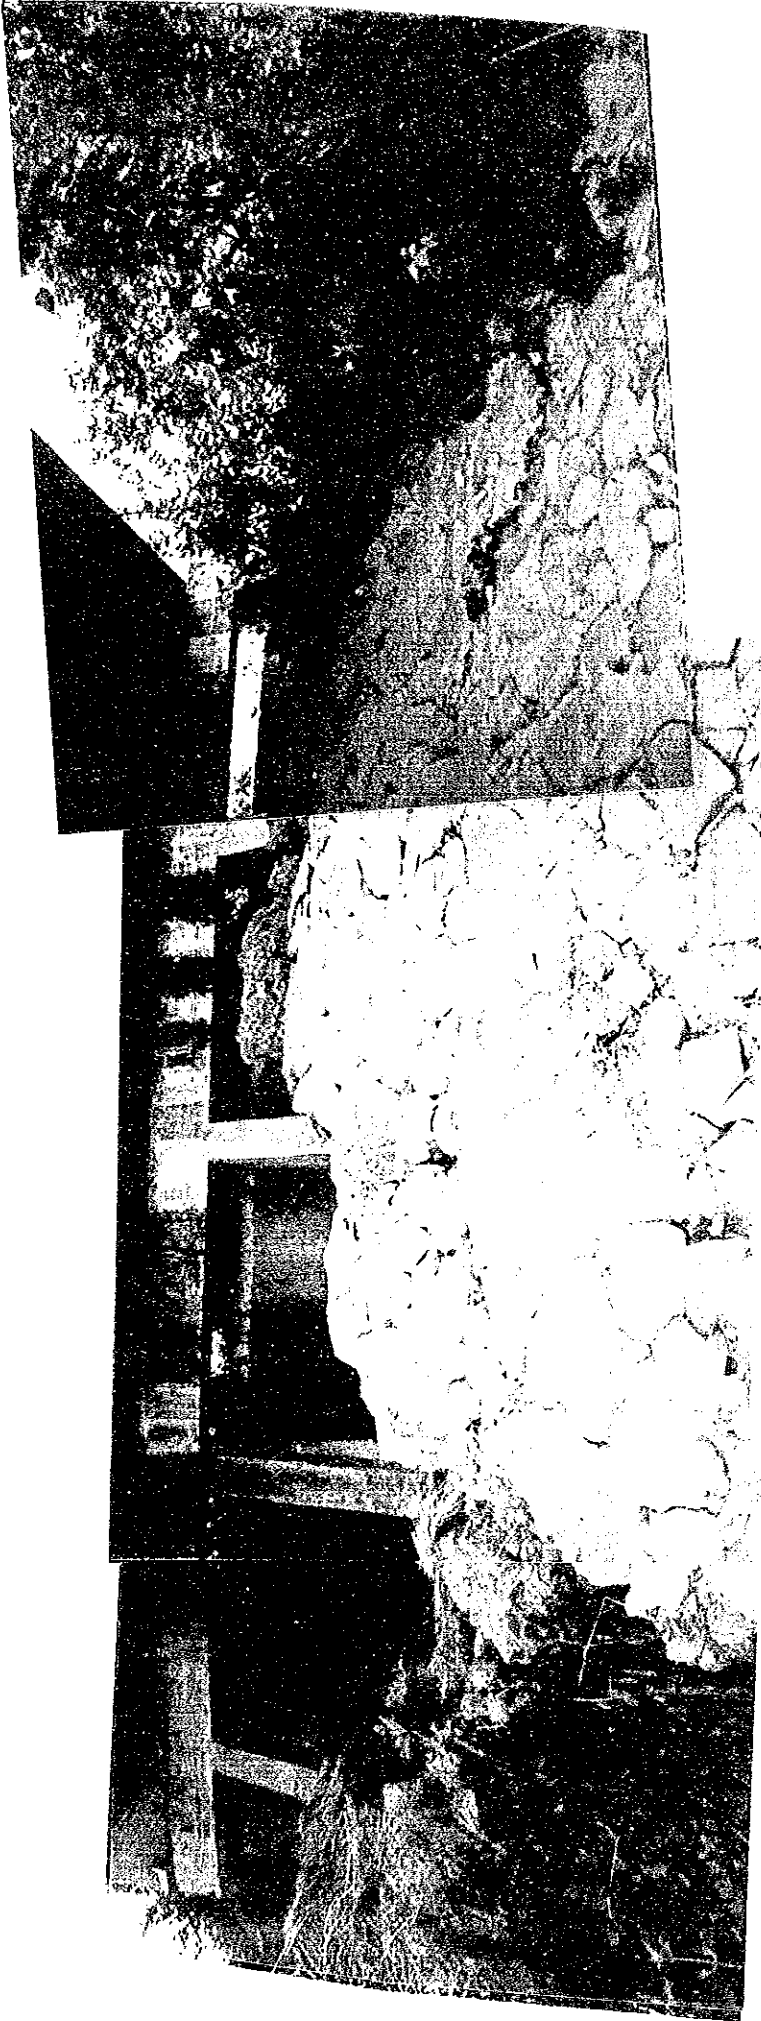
Deterioration of grouted riprap Chroy Changwar side
